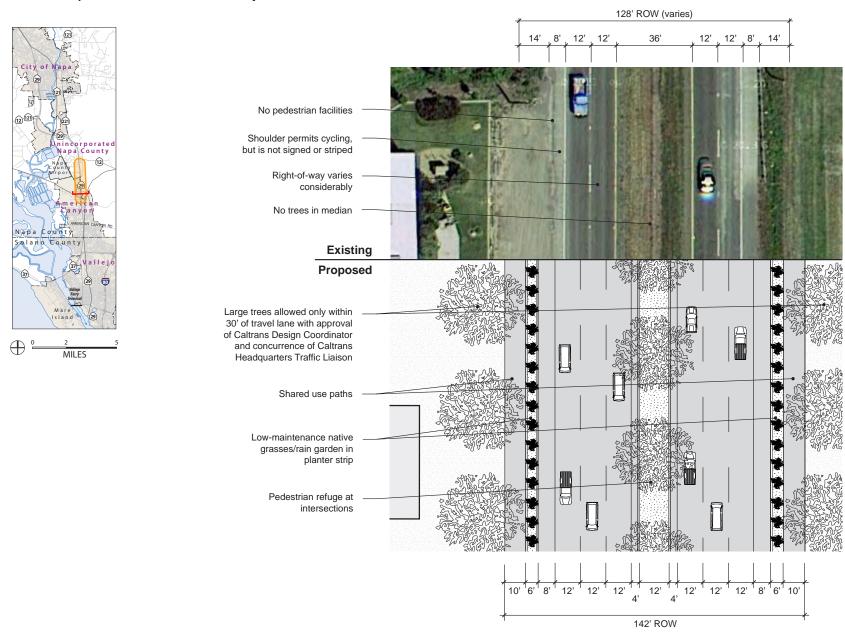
Proposed Section - Segment 4 Parkway Concept (Napa Junction Road to South Kelly Road)
